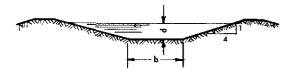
Dimensions of trapezoidal channels with 4 to 1 side slopes.
